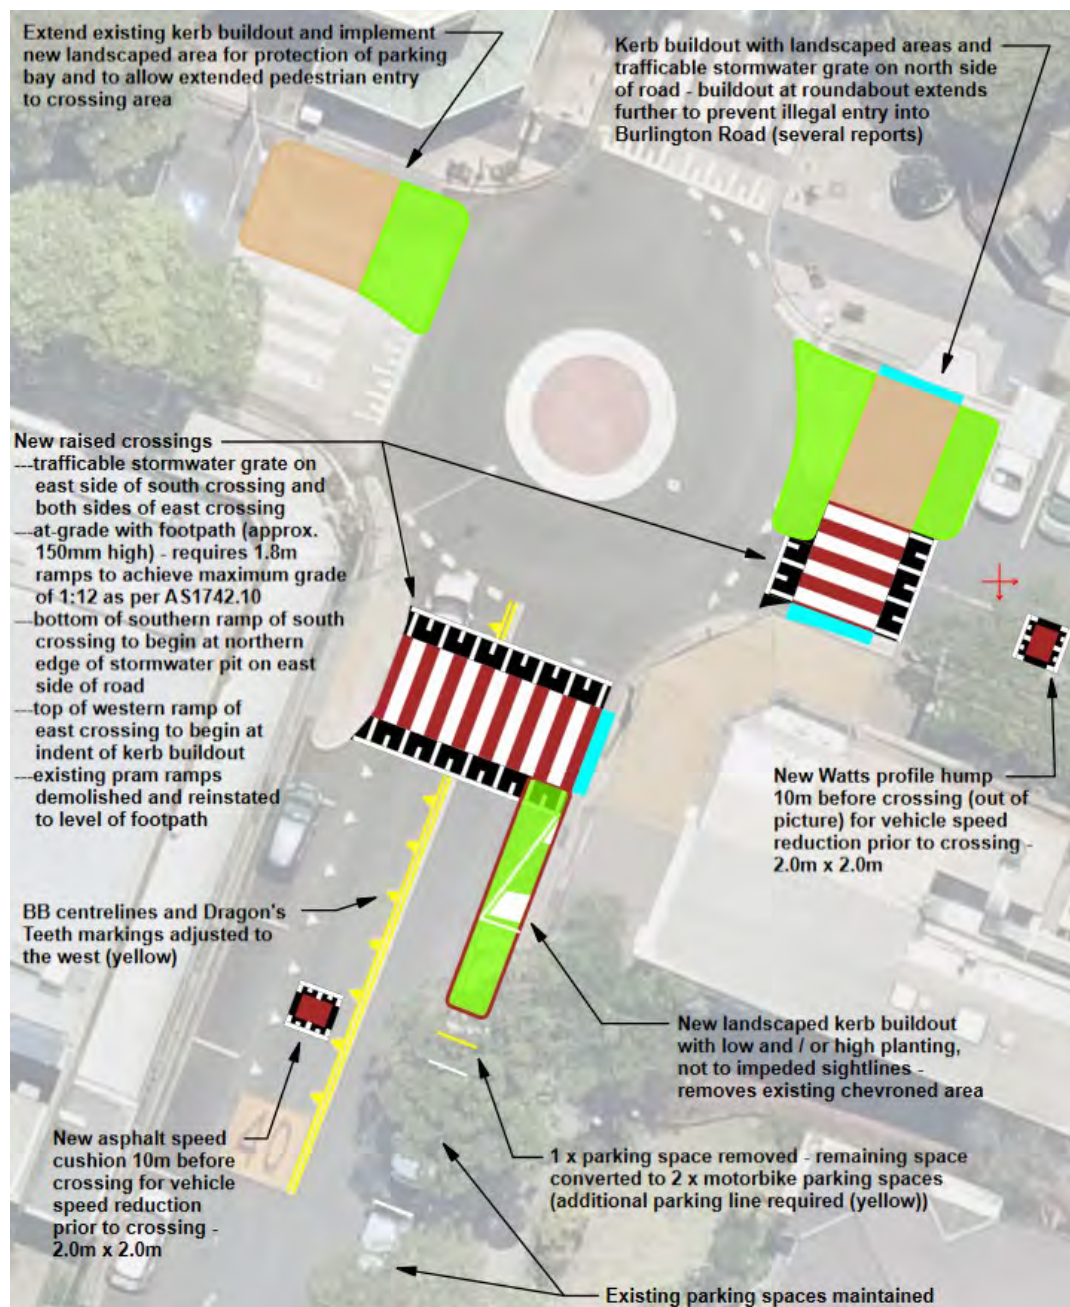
proposed Wombat crossings and kerb buildouts on Rochester Street and Burlington Road
